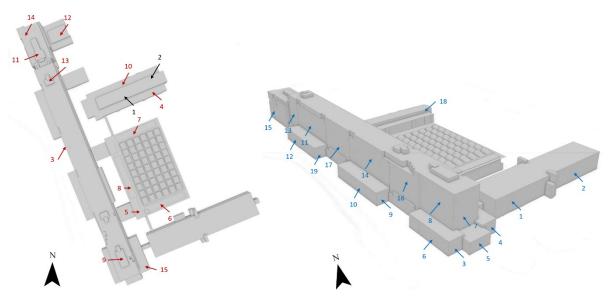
(left): CEG building, roof FIDs Figure 35 (right): CEG building, facade FIDs
